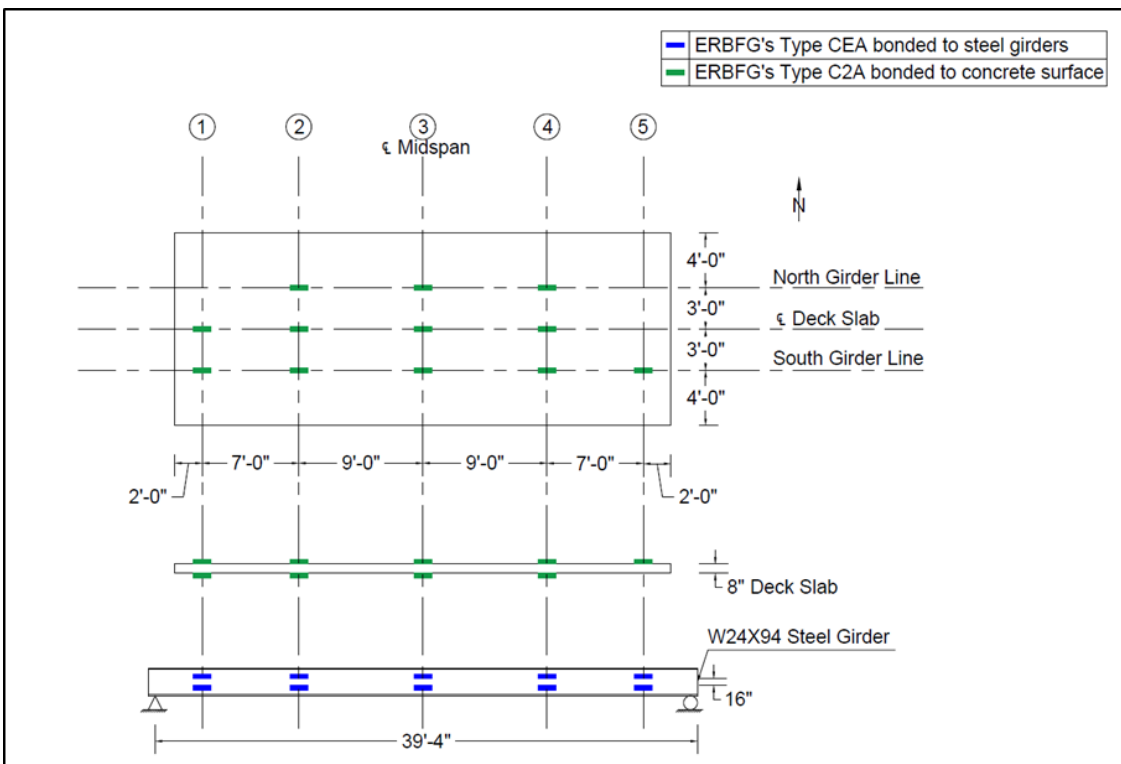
Layout of Electrical Resistance Bonded foil Strain Gages on the laboratory bridge deck and steel girders.
